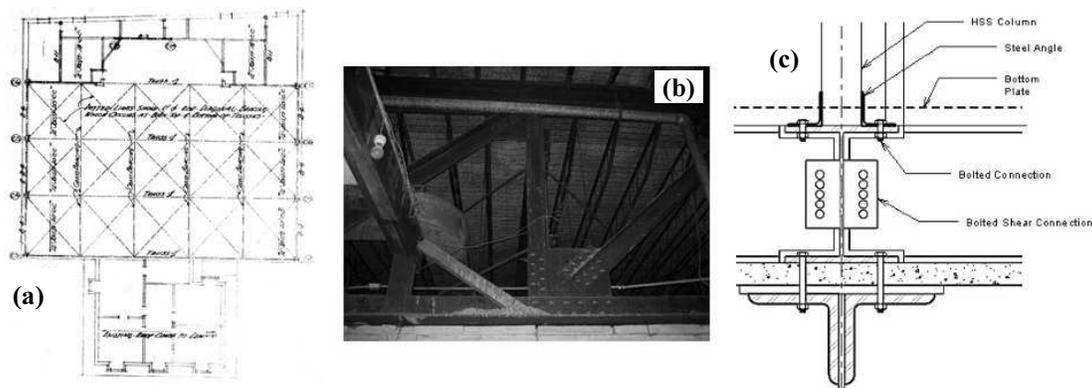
(a) Existing building roof plan; load bearing trusses are orientated left-to-right (b) Photo of load bearing truss (c) Intersection of four corner-post bearing modules.
